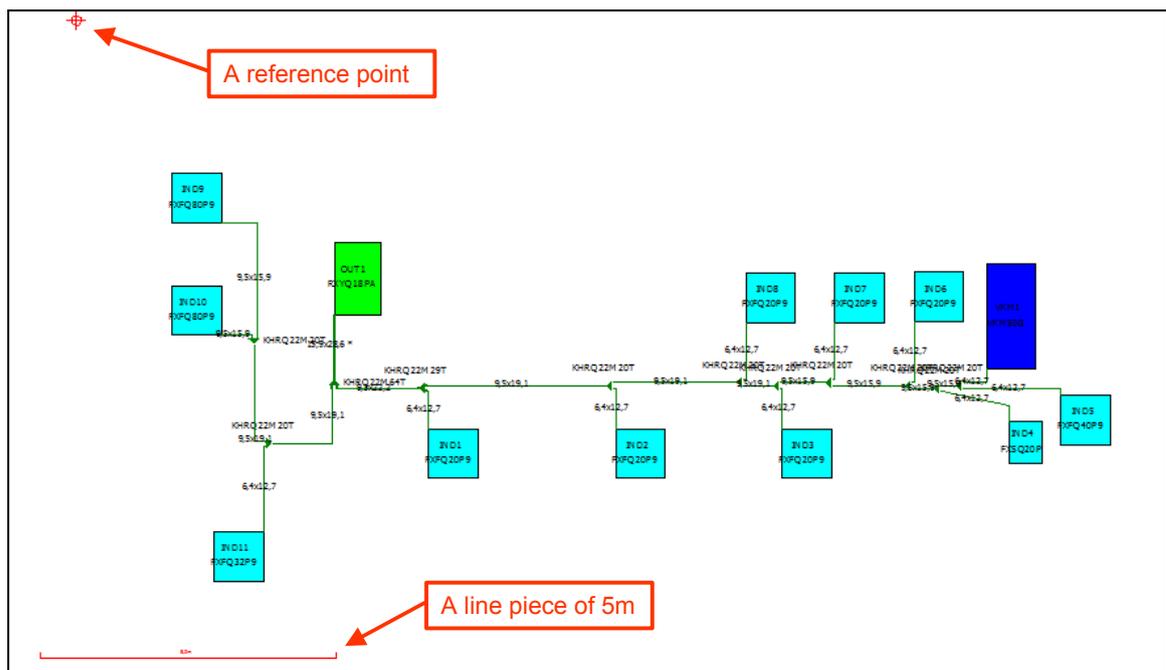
The floor plan piping, exported as an AutoCAD layer.
